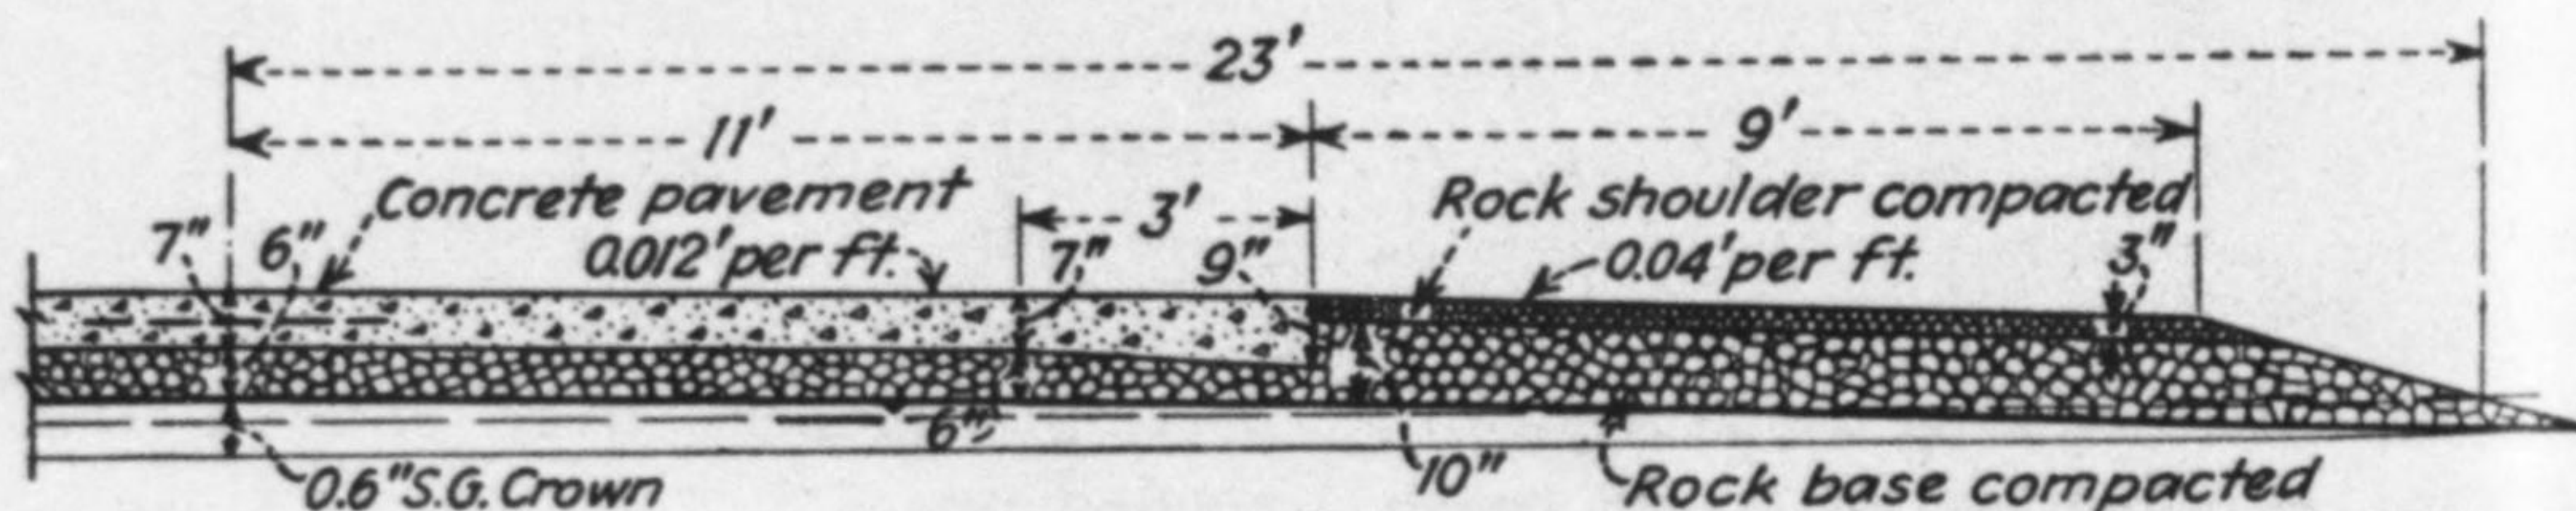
Cross-section of concrete pavement used in expansion joint study.
